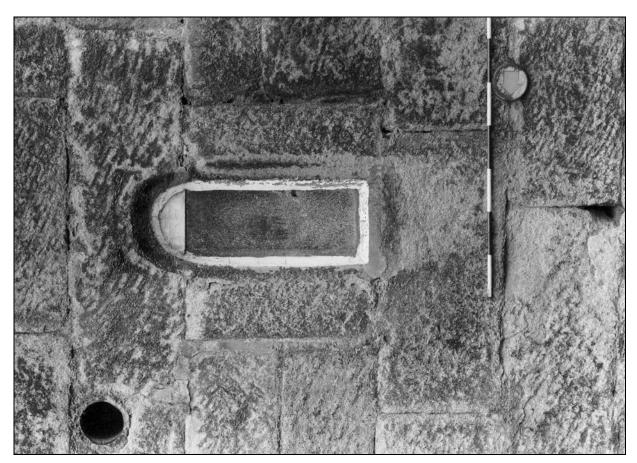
Detail of typical chamfered, arched breather, in east gable (film 2, frame 7)
